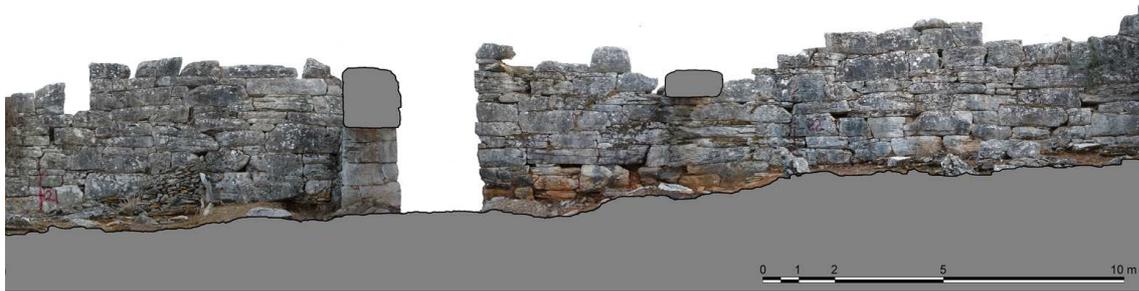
Mainland wall. Section of a U-shaped artillery tower and photoplan of the curtains (Cornieti 2008).
